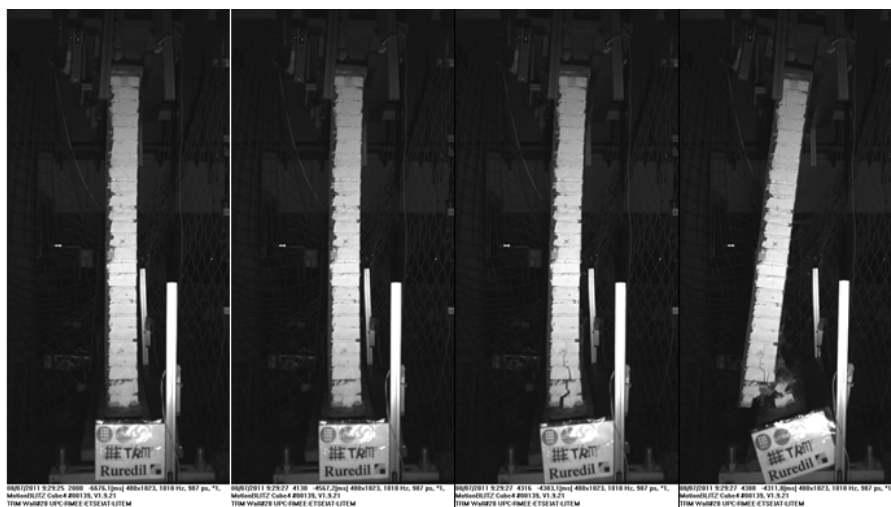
235 Failure of the wall W#28. Masonry failure at wall's bottom.
